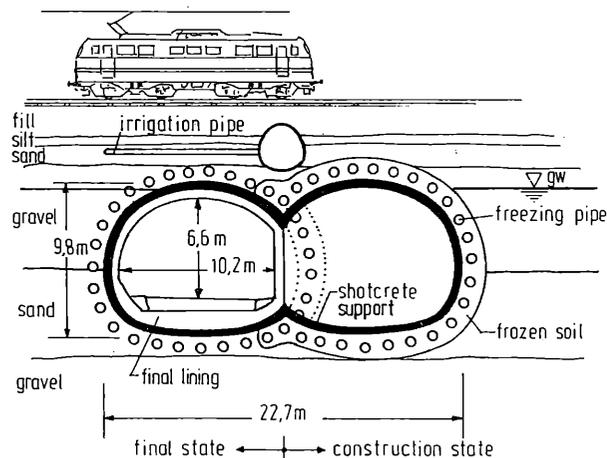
Fahrlach tunnel, Mannheim, tunneling with frozen soil support, DUSCH, MAYER (1989)
